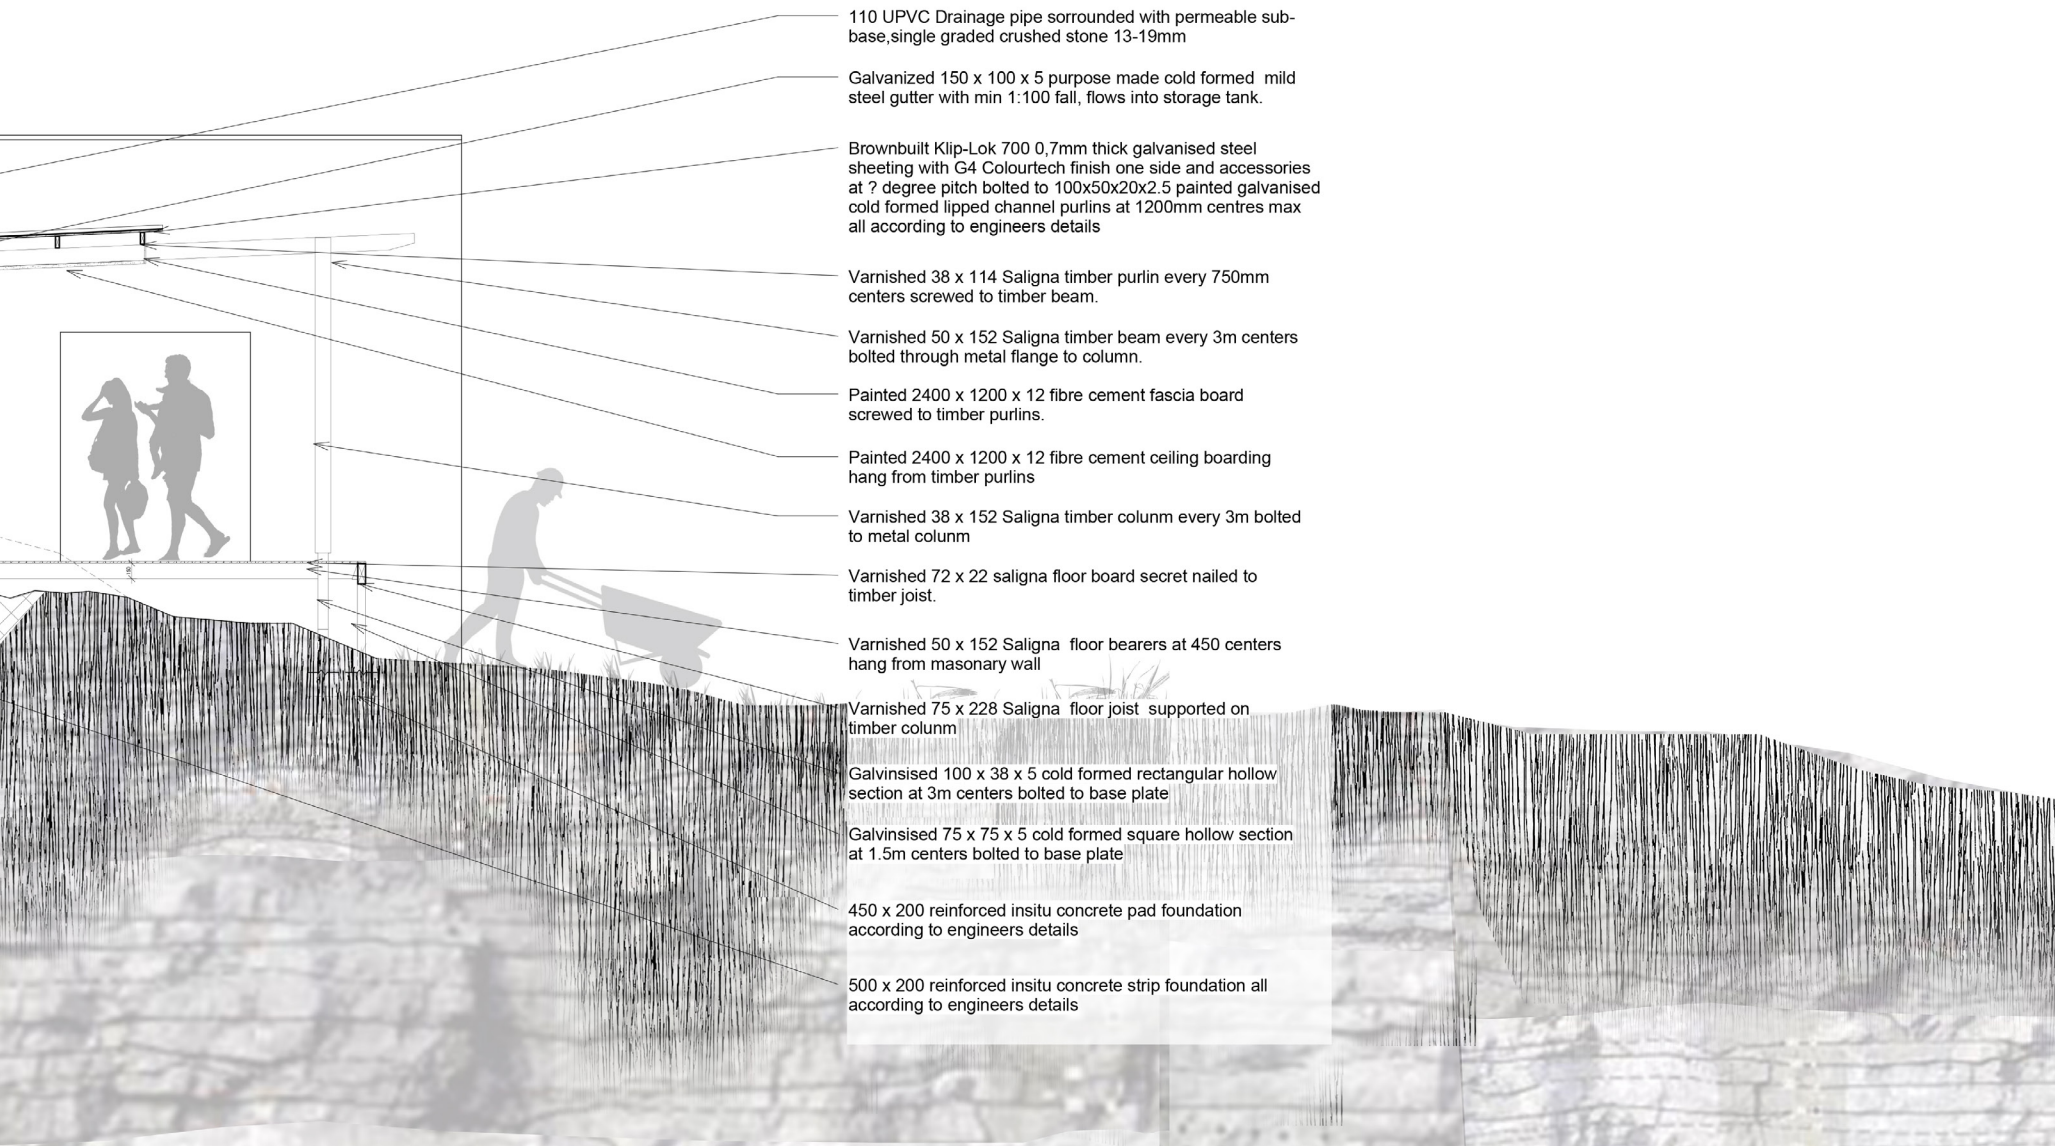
Section through vermiculture (Author, September 2016). 183
